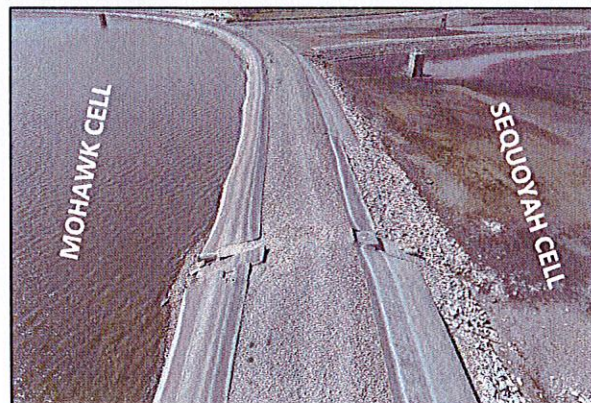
Showing the existing condition of the Additive Alternate #1 project area.
